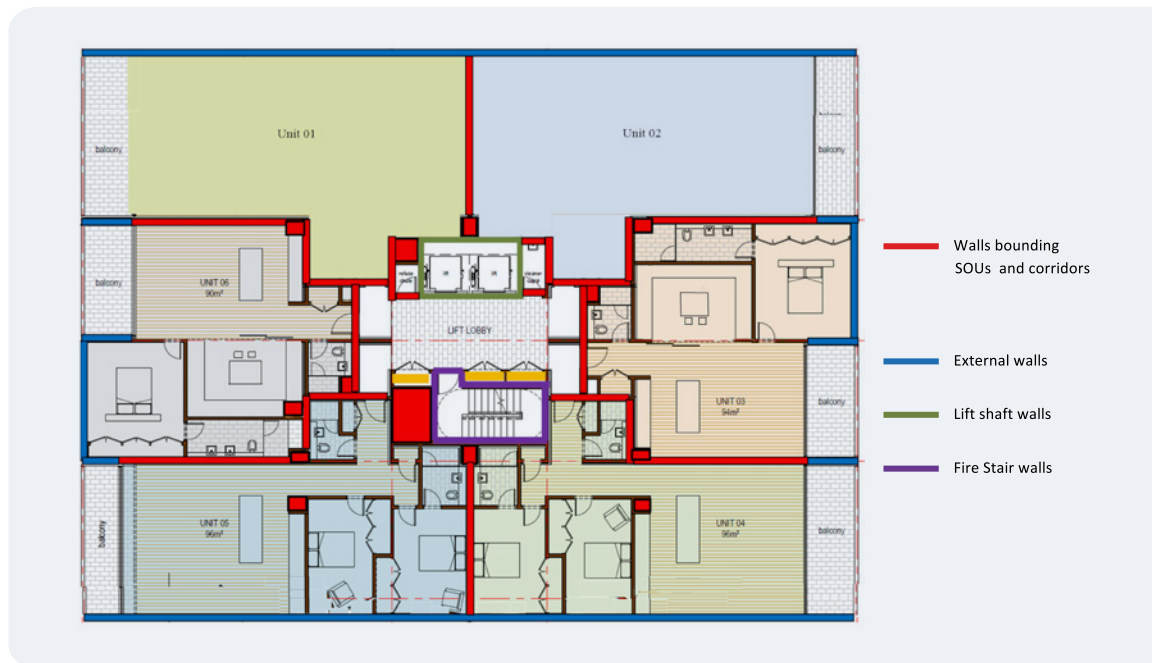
Example Class 2 building highlighting fire-protected timber walls.
